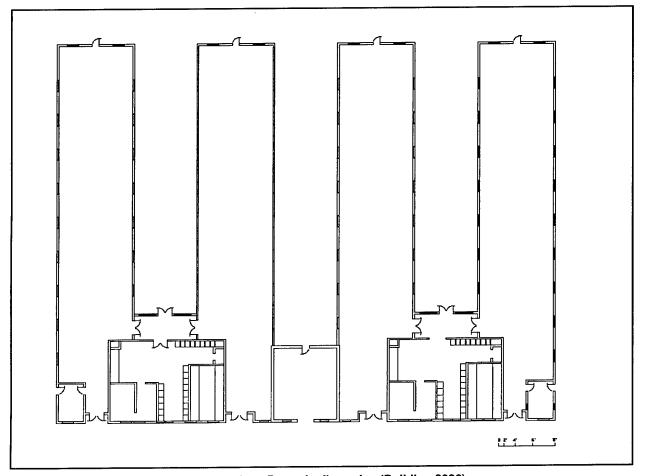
Exampale of an African American Barracks floor plan (Building 3086).
